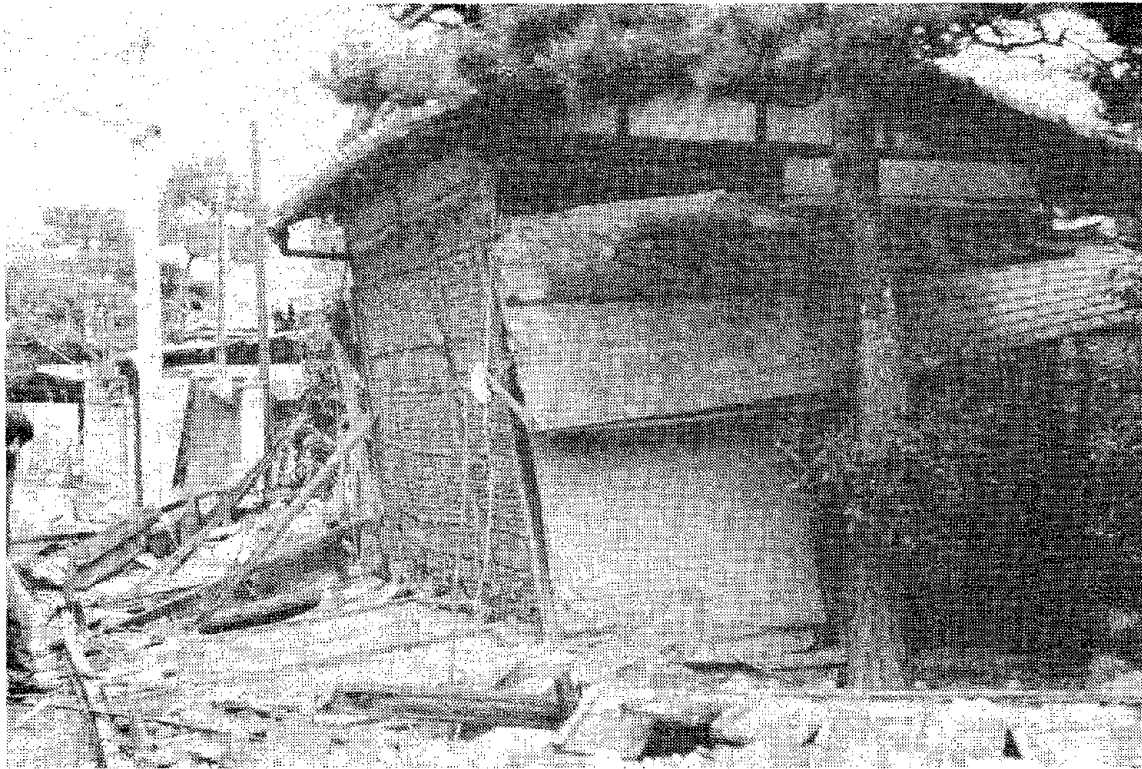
Residence in Nishinomiya. The collapsed wall of this teahouse illustrates typical frame and wall construction.
